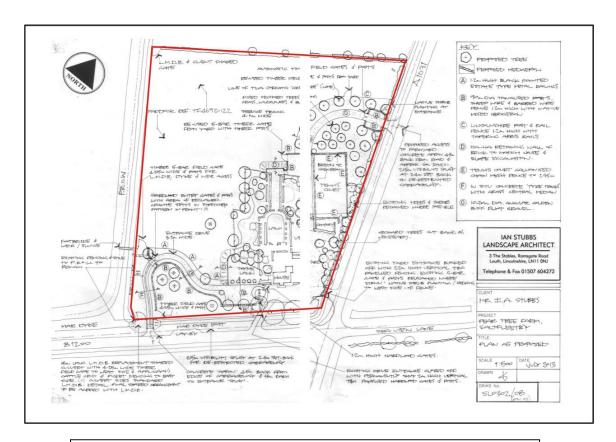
Detail plan of the proposed development. Not to Scale. Plan supplied by client.
